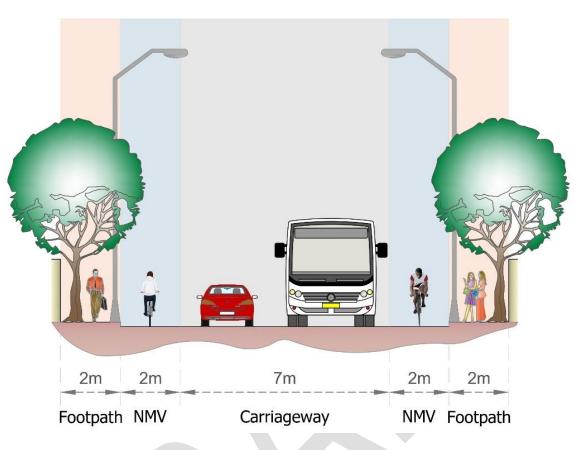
Typical Cross Section of 15m Wide Road with Bicycle Tracks
